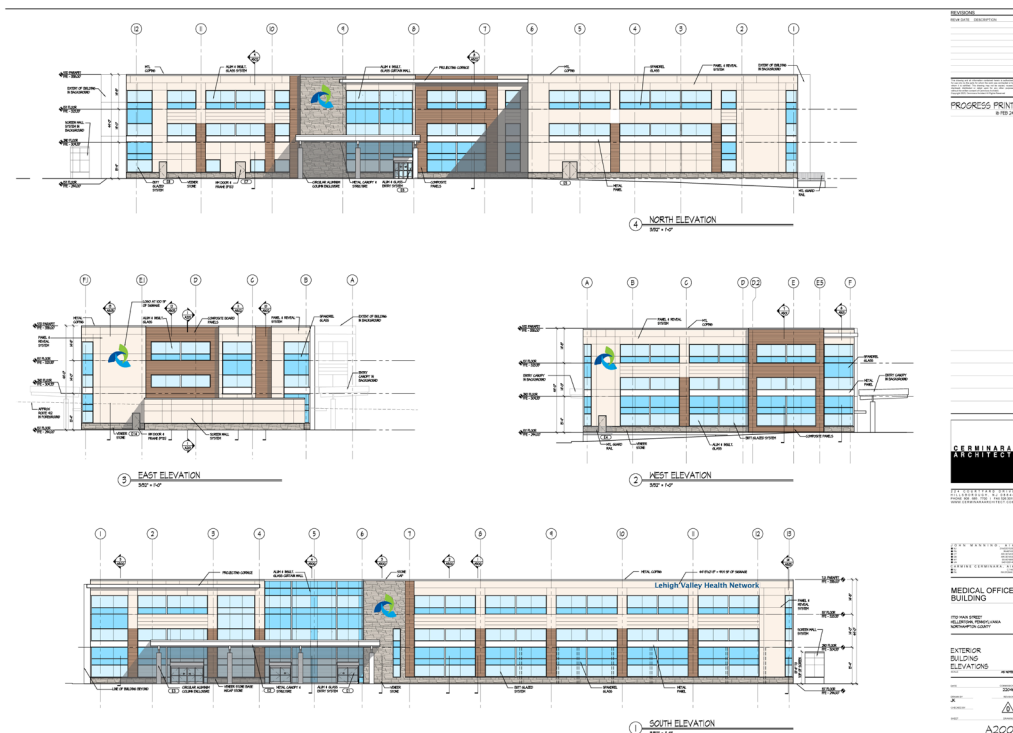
Elevation drawings for a proposed medical building at the Hellertown Manufacturing Co. site (Pennsylvania). Image used with permission of Cerminara Architect.
